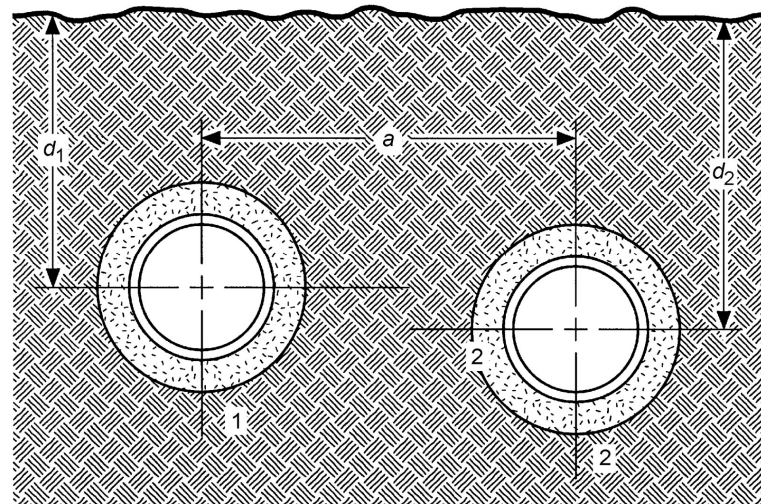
Schematic drawing of a pipeline buried underground (ASHRAE, 2008)
